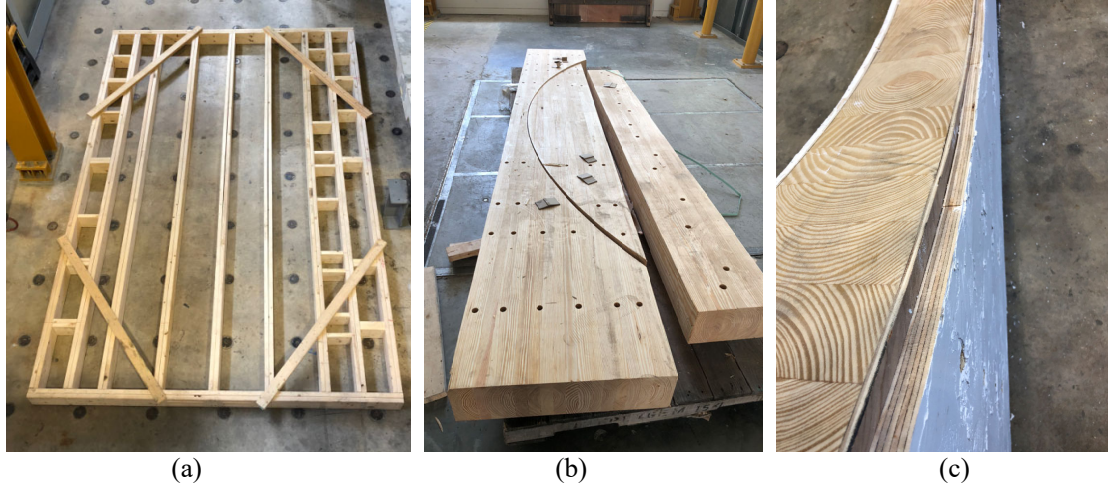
Wall Construction and Installation of Top and Bottom Glulam Beams
